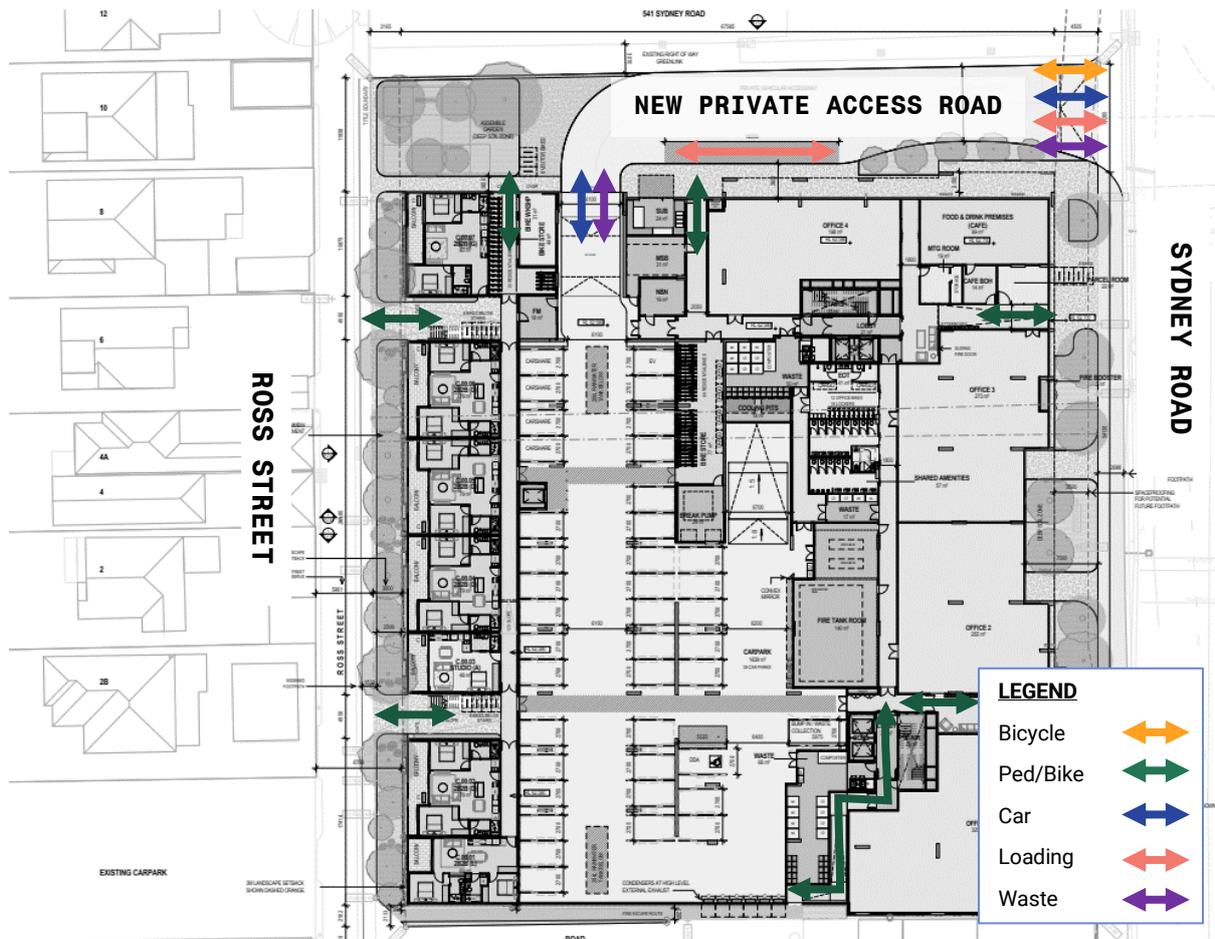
Proposed Site Access and Movement Arrangements (All Modes of Transport)
